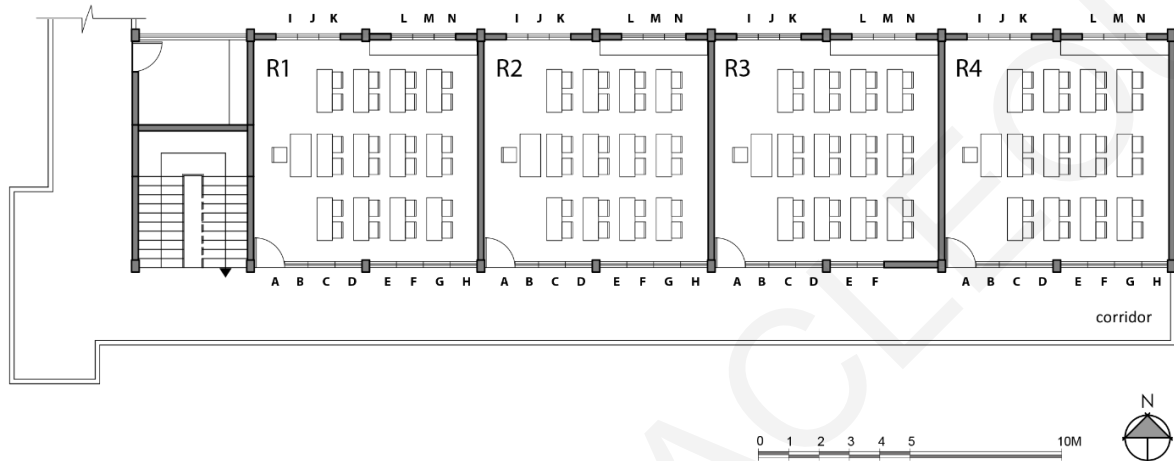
Layout plan of a characteristic secondary school classroom in Cyprus. Openings are marked from A to N.
